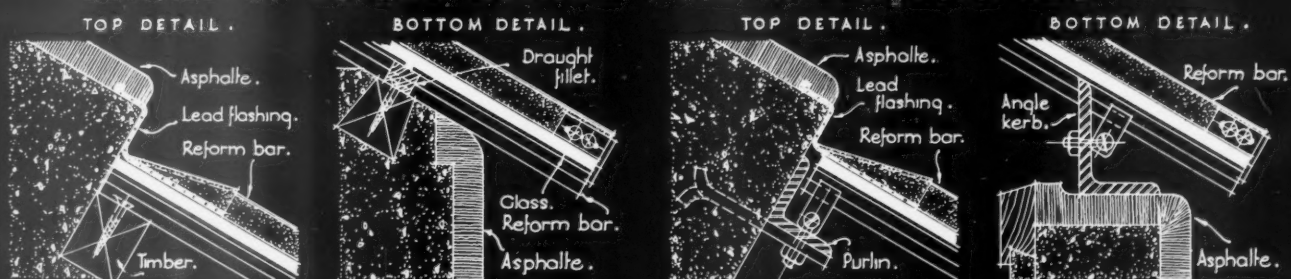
## DETAILS OF REFORM GLAZING FIXED TO WOODWORK :
